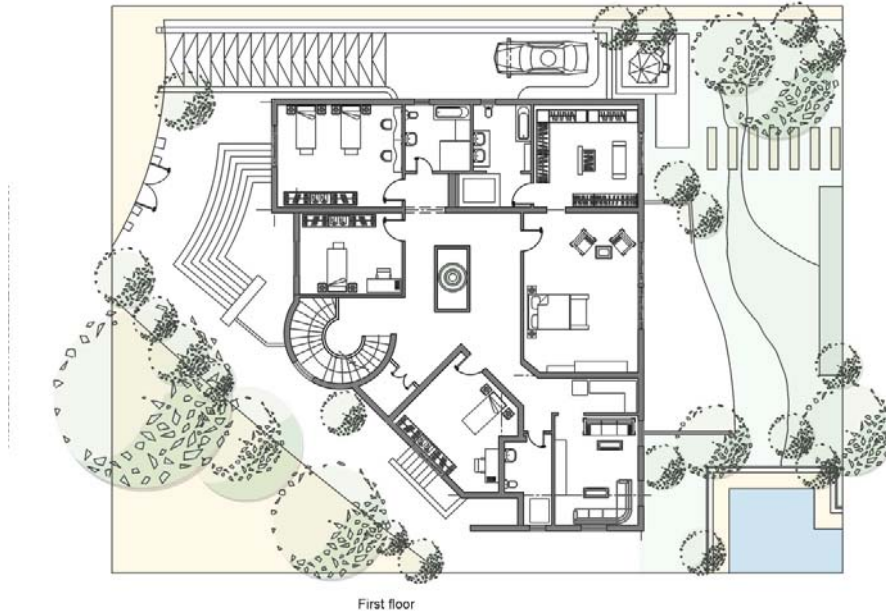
First floor plan of the villa in 6th of October District in Giza.
